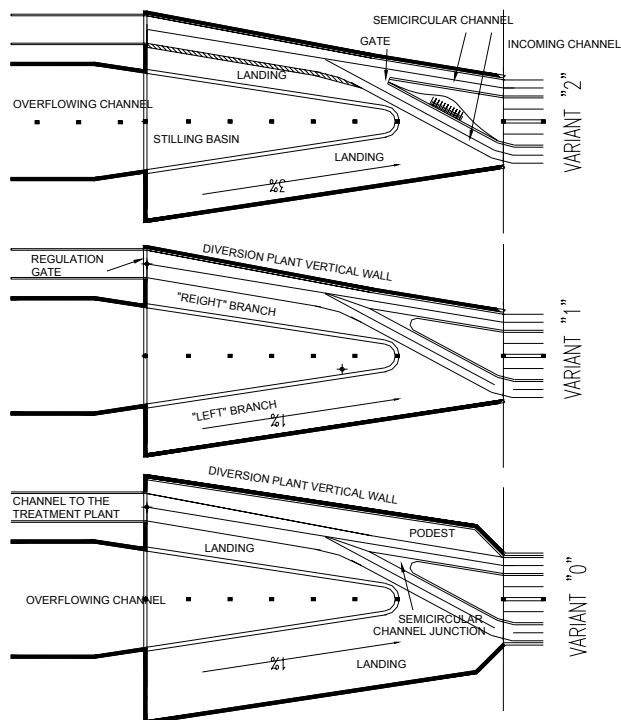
,b,c plan view for variant solutions "0", "1", "2" of diversion plant
